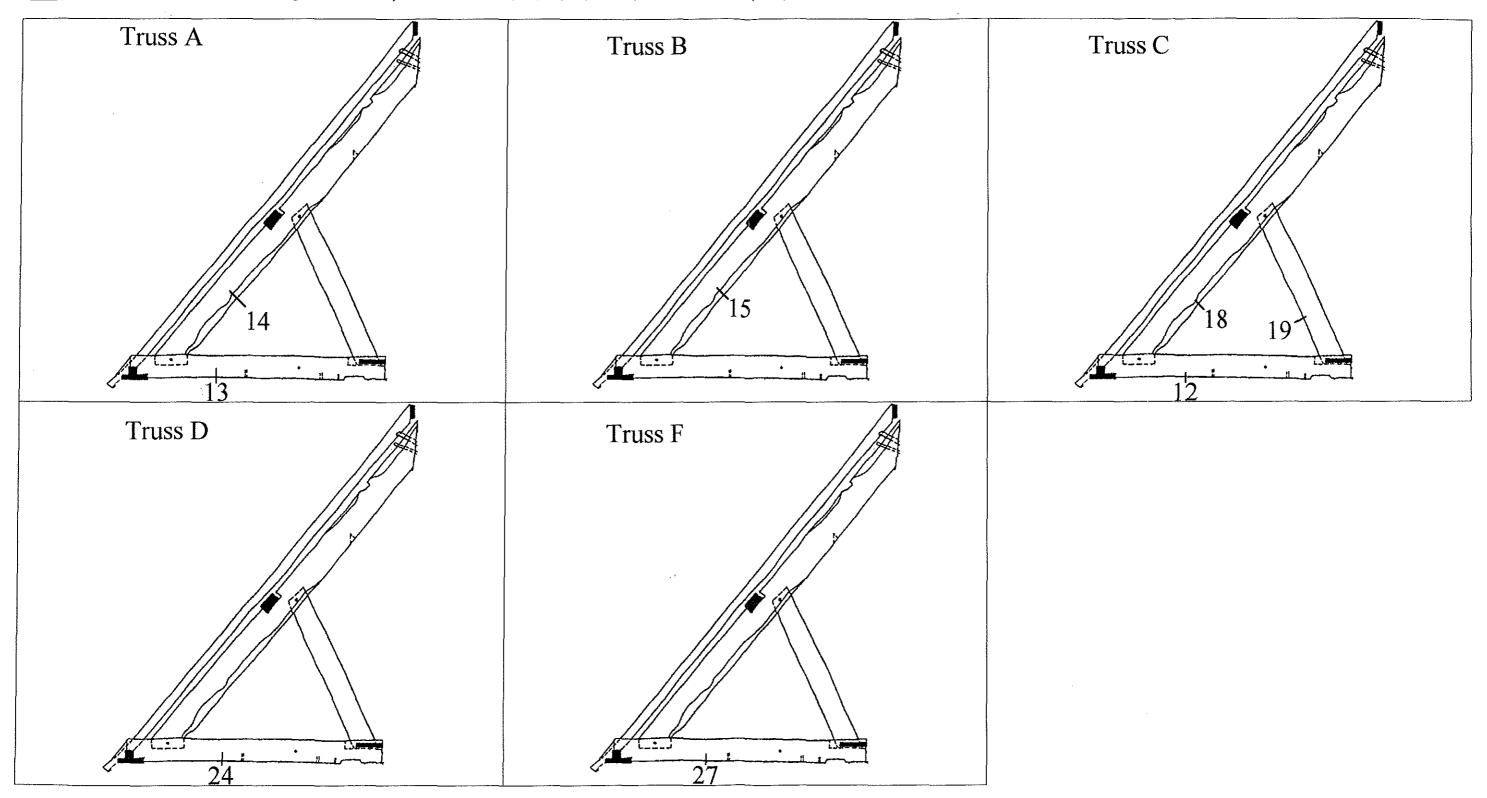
Trusses A, B, C, D, and F showing location of samples 12-15 inclusive, 18, 19, 24, and 27, after Morriss et al (1998) truss K.
